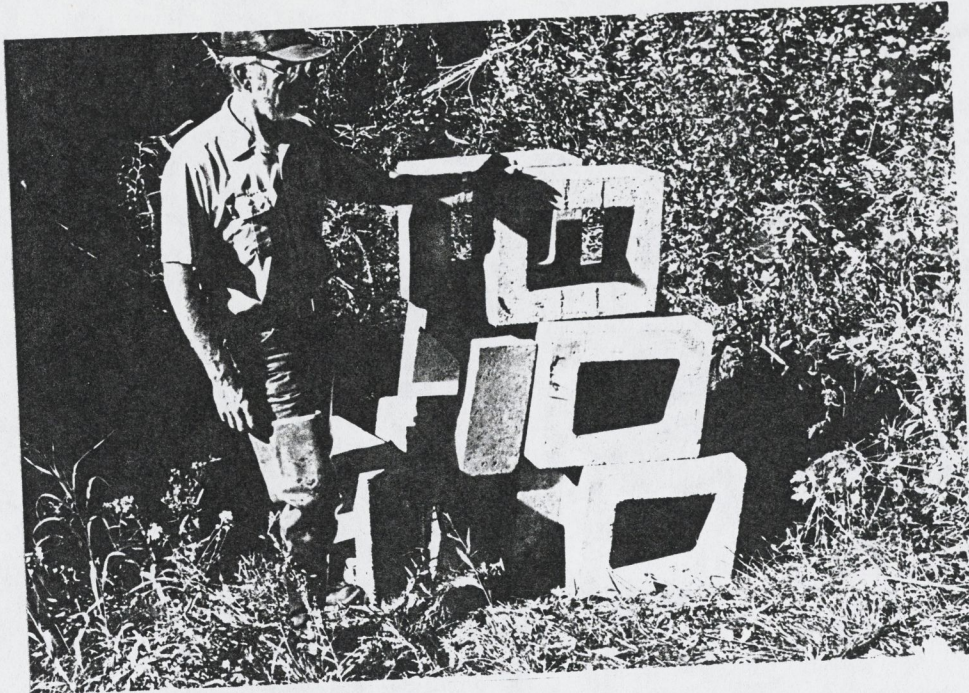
Trinity Creek Culvert - A "Salmon CMP Downrigger" Fish Ladder Kit
